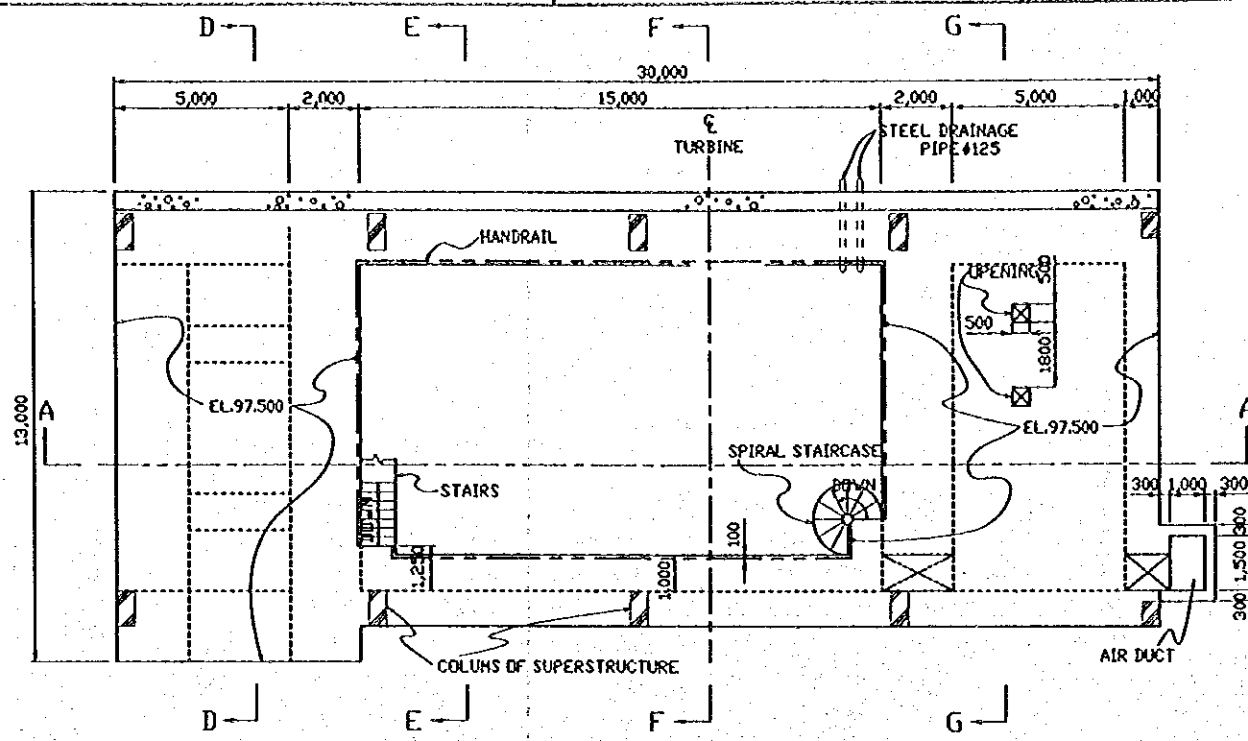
(1/2) Powerhouse Concrete Outline - Sections
